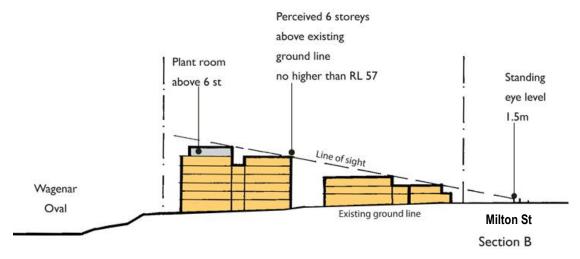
Section B-Section across from Milton St to the Oval near entry access road (Northern Site)
